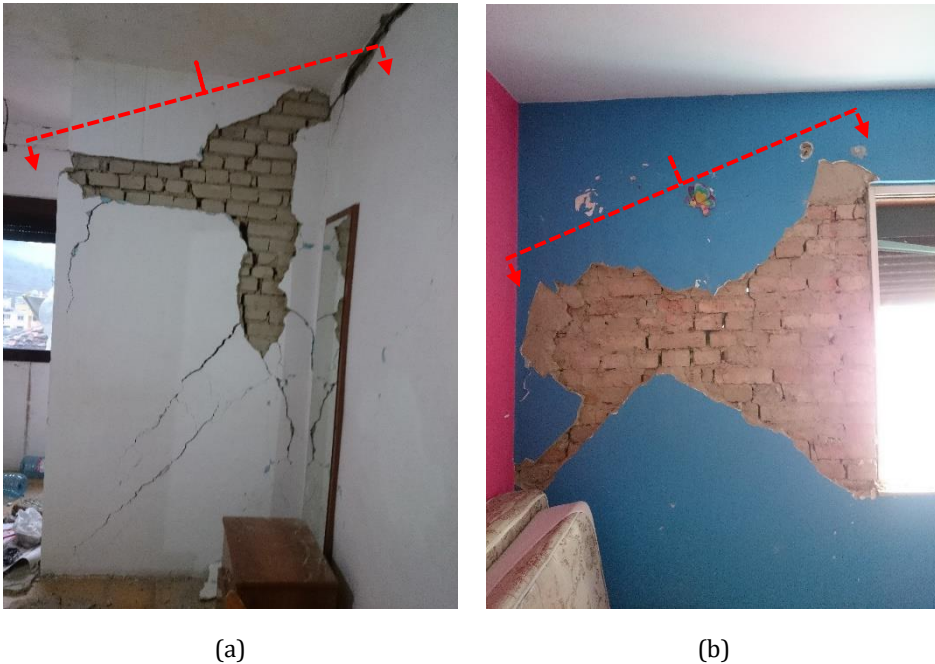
(a) Heavily damaged load bearing wall (built by silicate bricks) and separation of wall and slab edges, (b) Heavily damaged load bearing wall in an URM building built by red clay bricks
